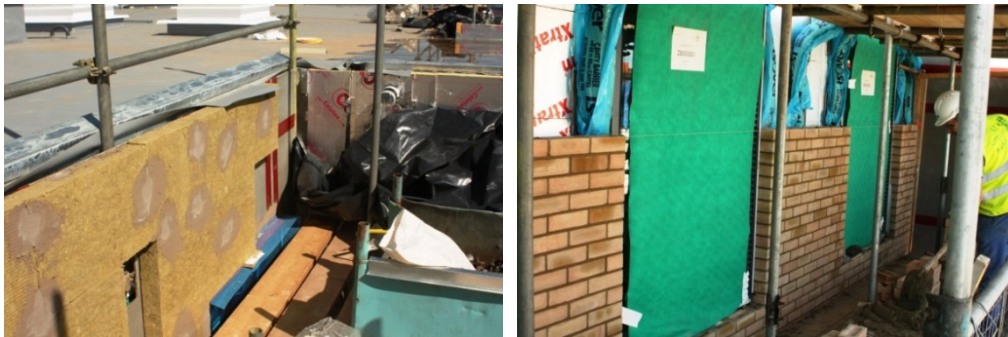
(left): Site photo: Roof on top and rigid insulation being fitted to walls [REDACTED] 2012]
